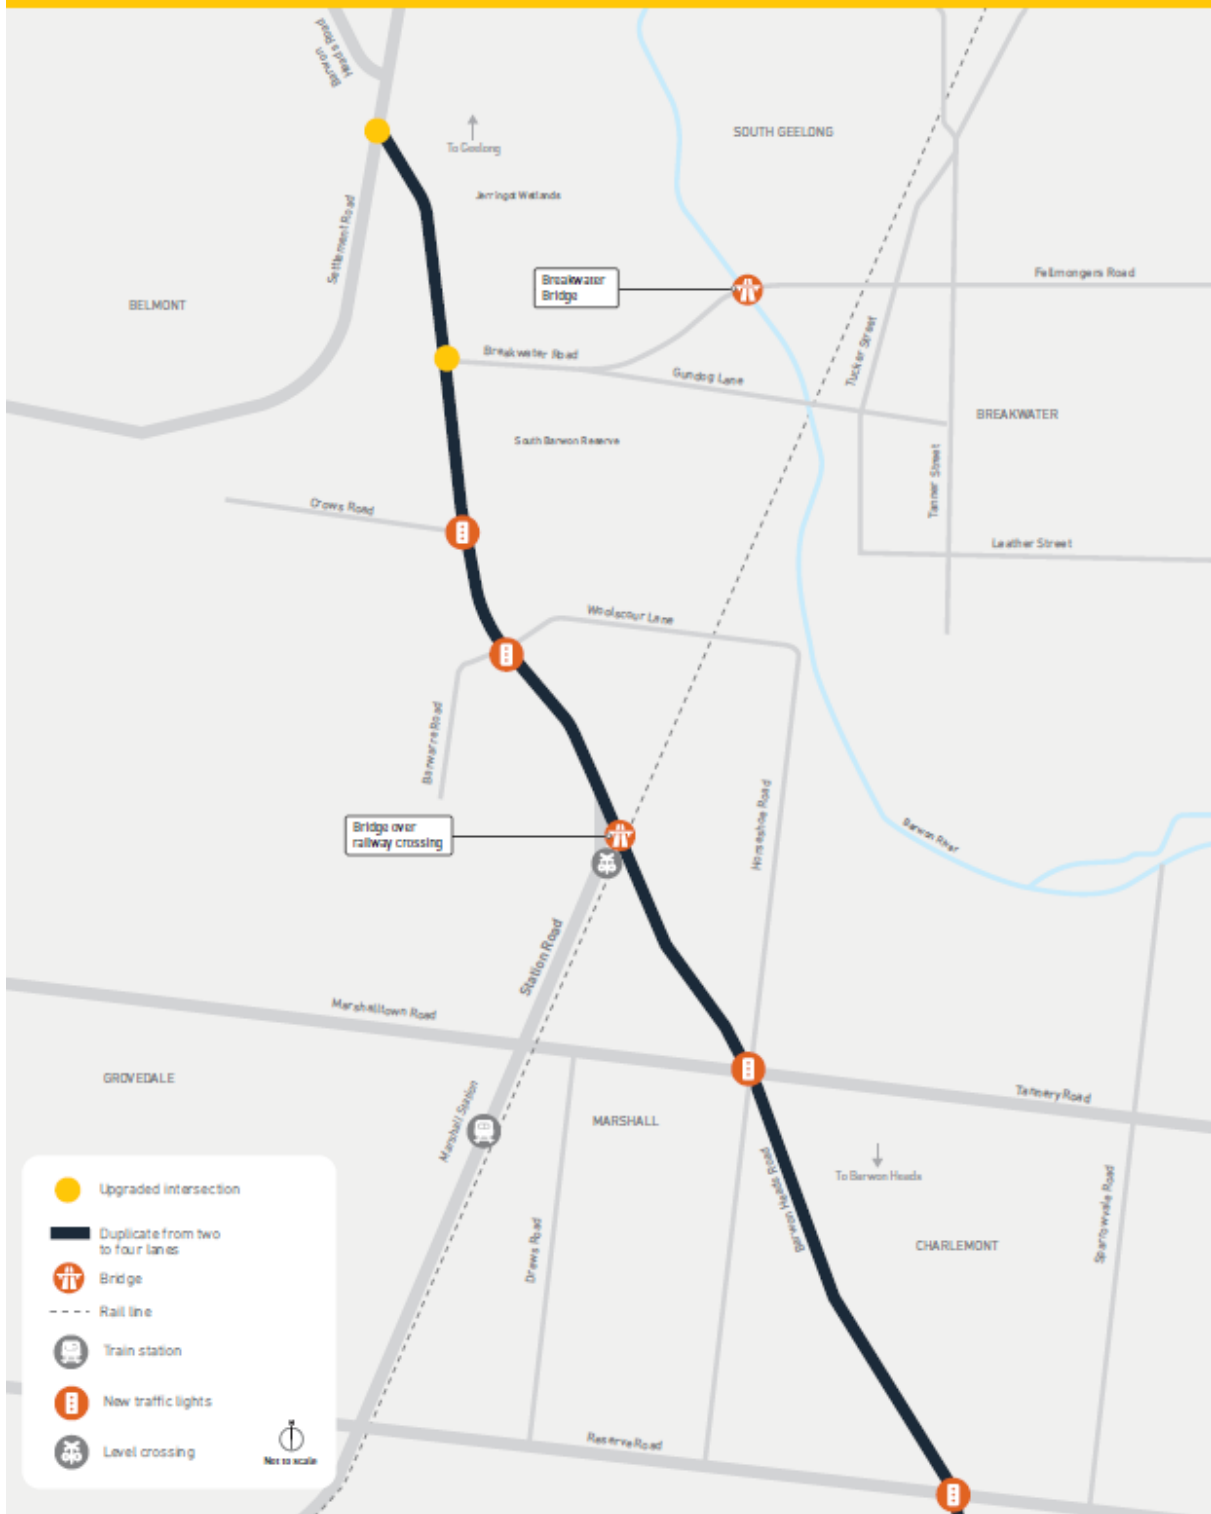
Barwon Heads (Settlement Road to Reserve Road) Duplication Project
